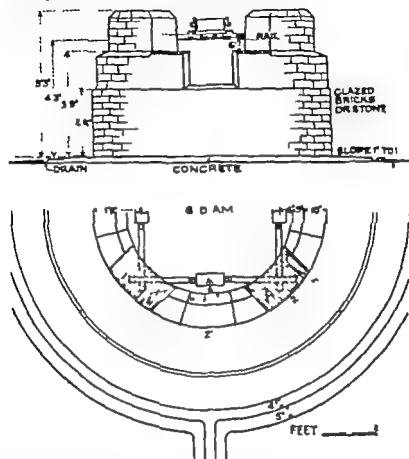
Sanitary draw well parapet designed by the Assam Mines Board of Health.
